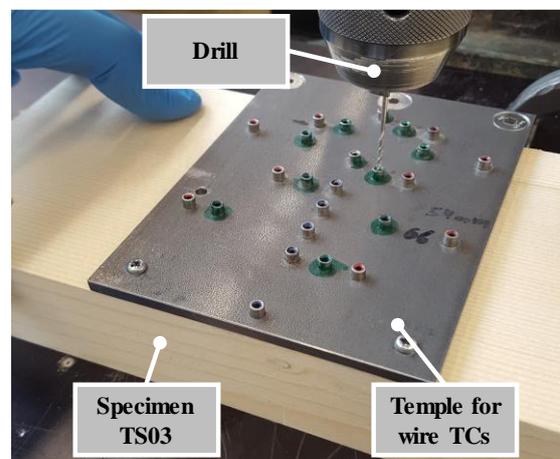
Drilling of boreholes to install the wire thermocouples (TCs).
